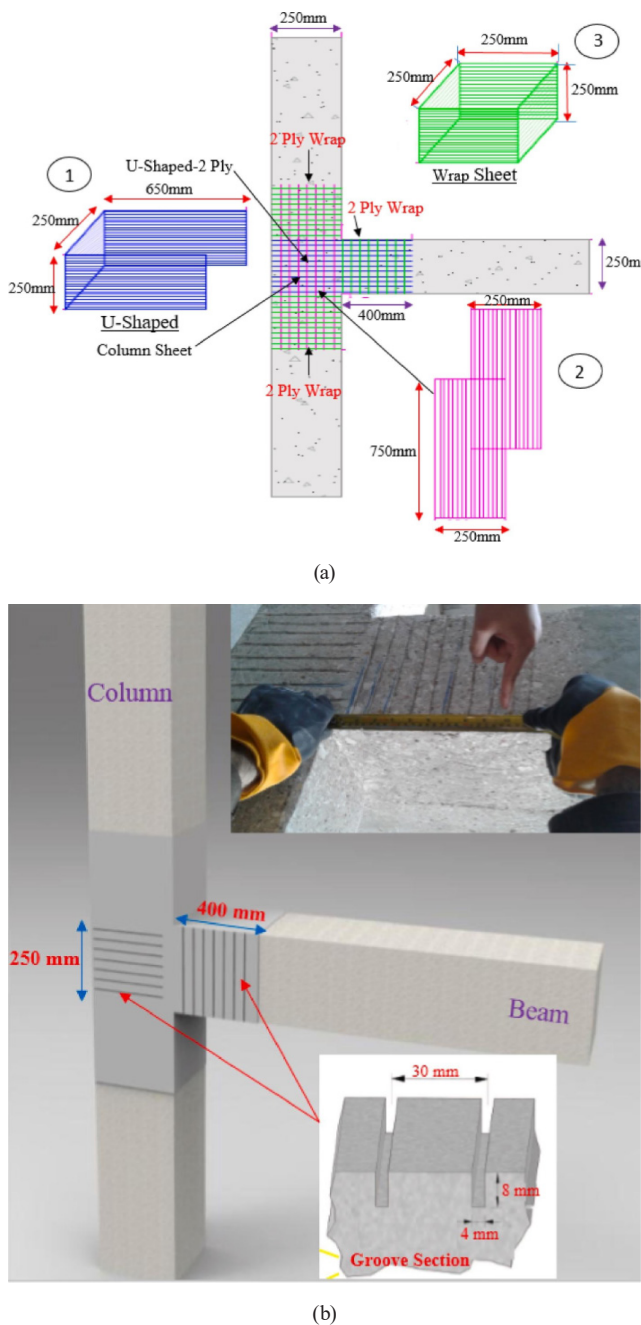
Retrofitting details of R2NS specimen; (a) Layers configurations detail; (b) Grooving method detail [24]
